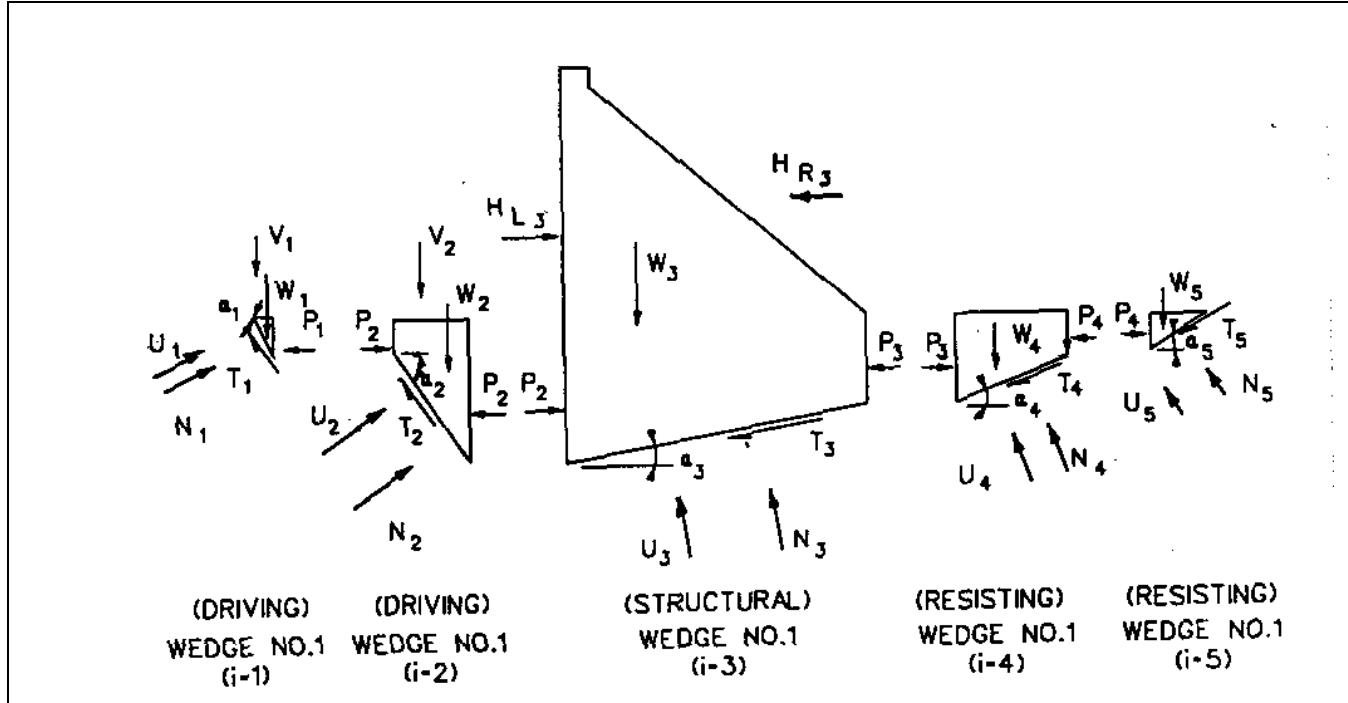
Dam foundation system, showing driving, structural, and resisting wedges
